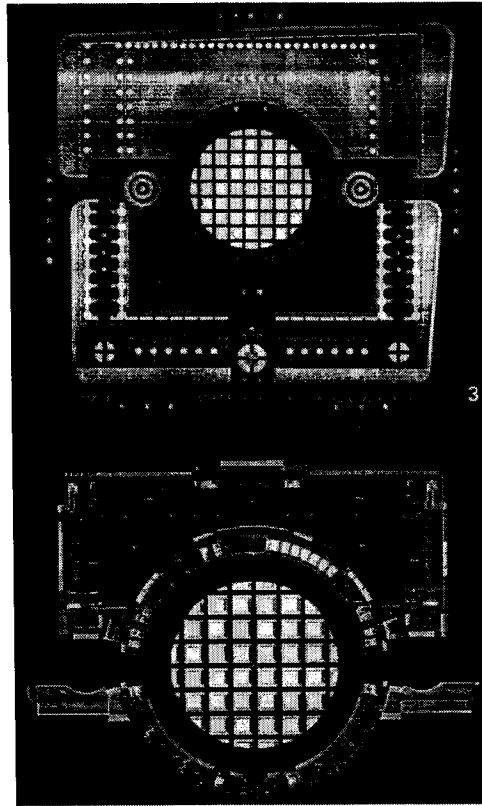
China Industrial and Commercial Bank, plans (top: site plan; bottom: ground-floor plan), 1994-1998
